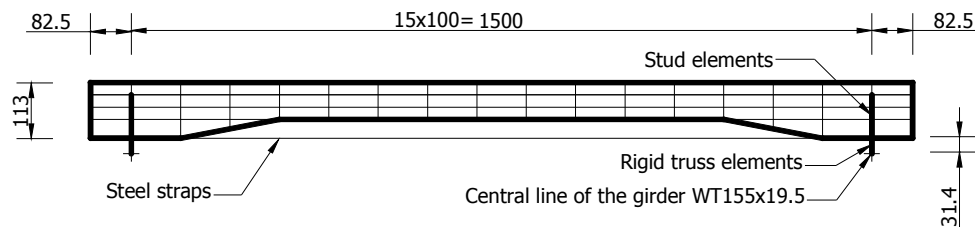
Transverse cross section of the finite element model of the deck (dimensions in mm).
